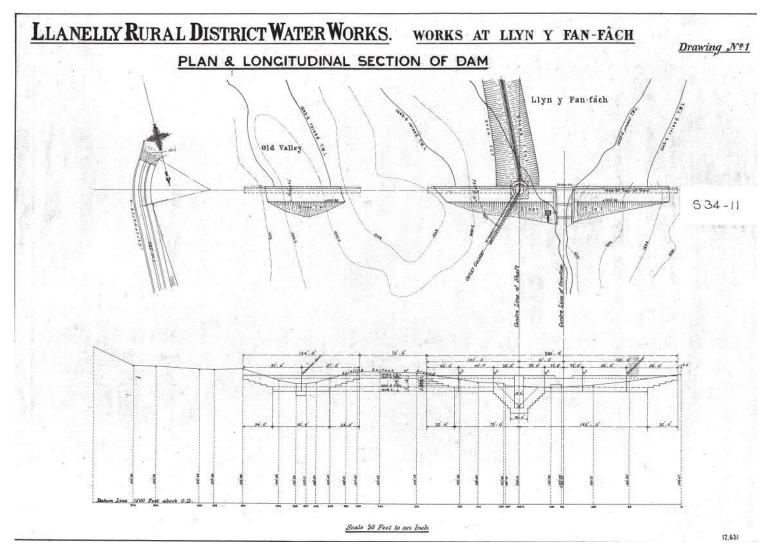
Original plans and section of the reservoir dam wall at Llyn y Fan Fach.
